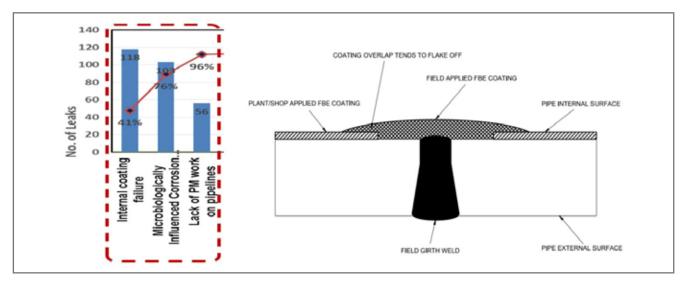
Pareto Root Cause Analysis and coating failure at Girth welds.
